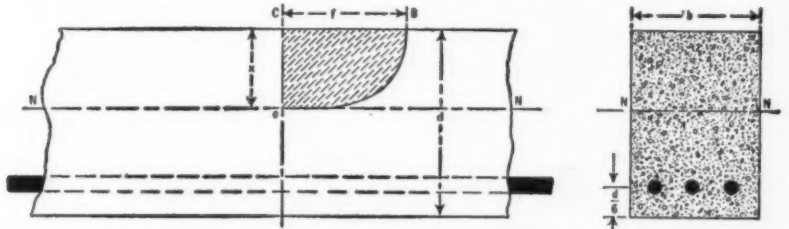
TO ILLUSTRATE HATT'S METHOD OF CALCULATING THE ARMORING REQUIRED FOR A CONCRETE BEAM.
